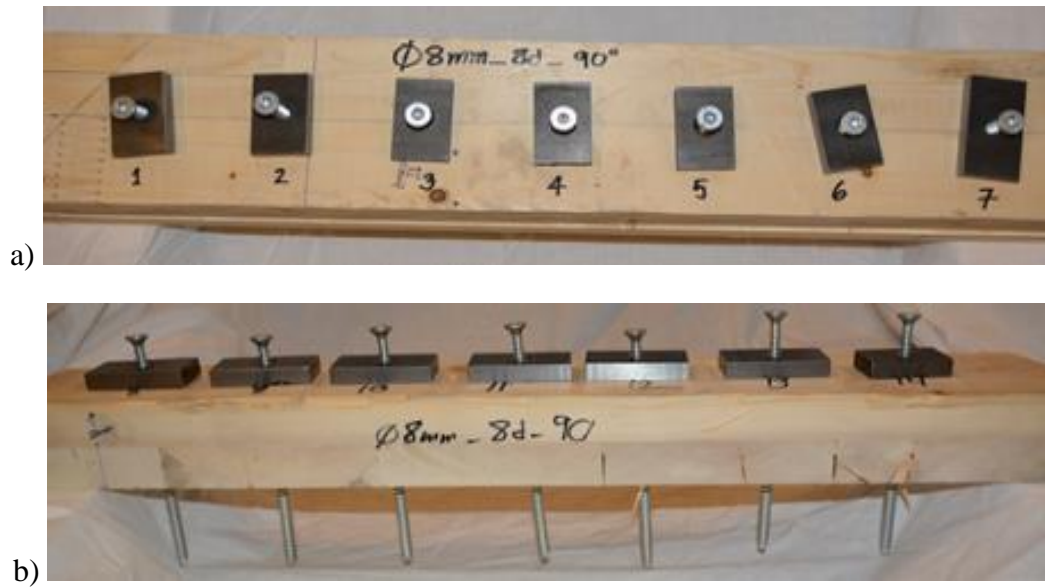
Typical test specimen: a) plan view, and b) elevation view
